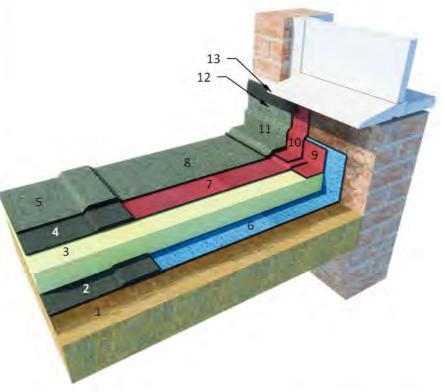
DETAIL DRAWING IS INDICATIVE ONLY IS FOR GUIDANCE PURPOSES ONLY.
